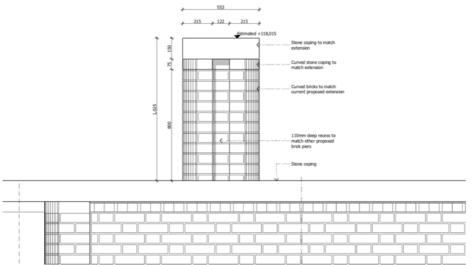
Extract from drawing no (817)210\_PL06 showing the proposed chimney design
